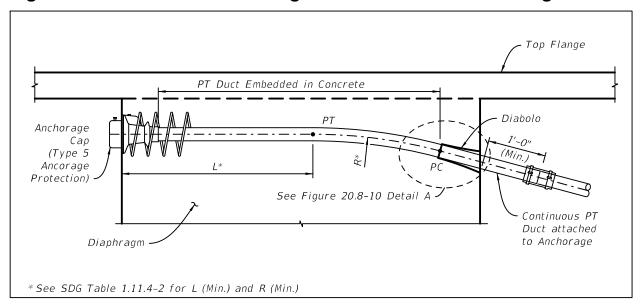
Detail at Expansion Joint Segment with Tendon Anchorage
